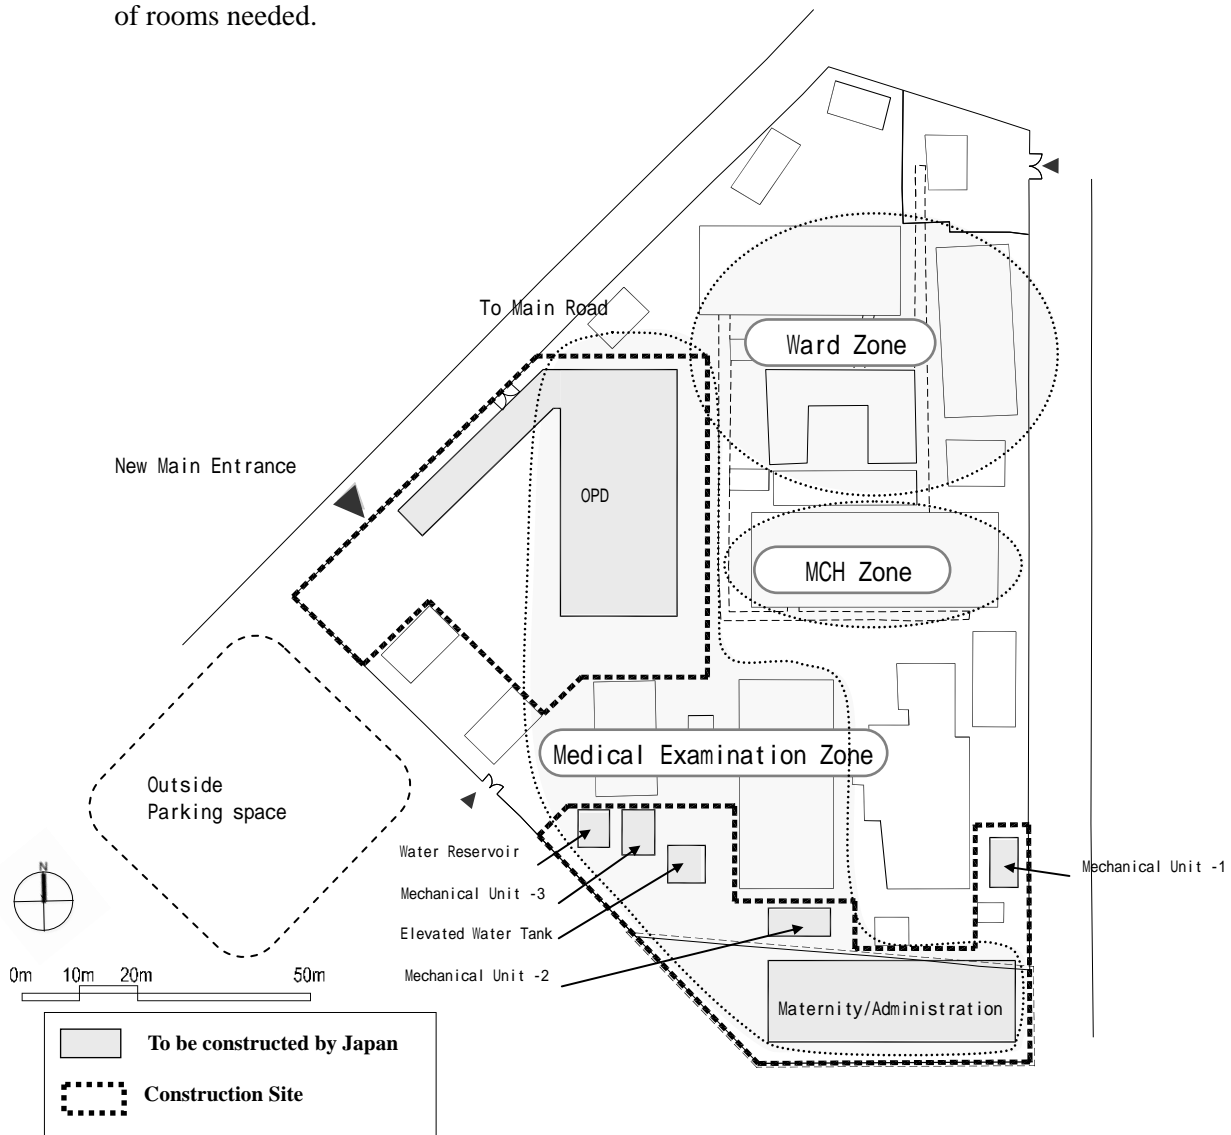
Facilities improvement master plan for Chilenje UHC
